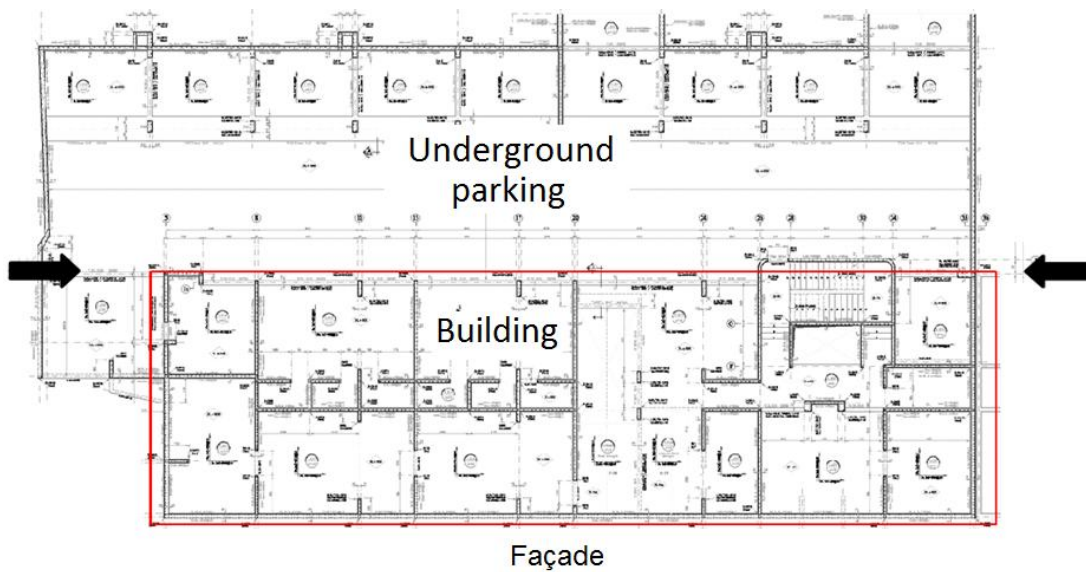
Plan of the first basement of the Alto Río building. Note the scarcity of vertical elements on the longitudinal axis of the building's back façade (arrows).
